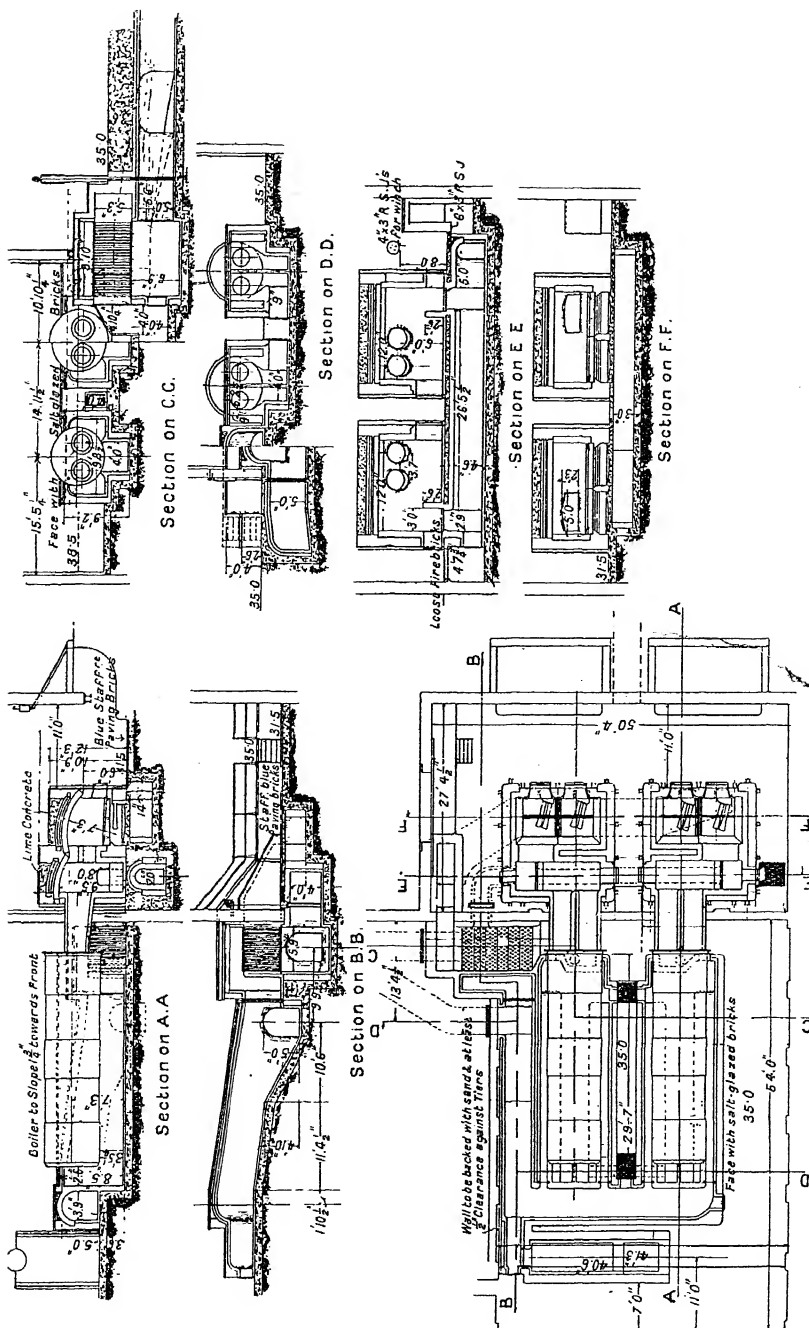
Meldrum's Front-F destructor at Twickenham. Plan and sections.
